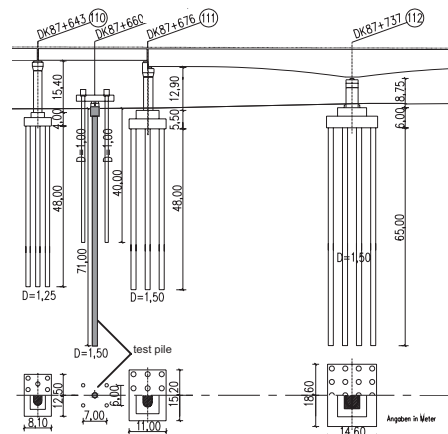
Position of the pile load test in the area of a 3-span bridge.
